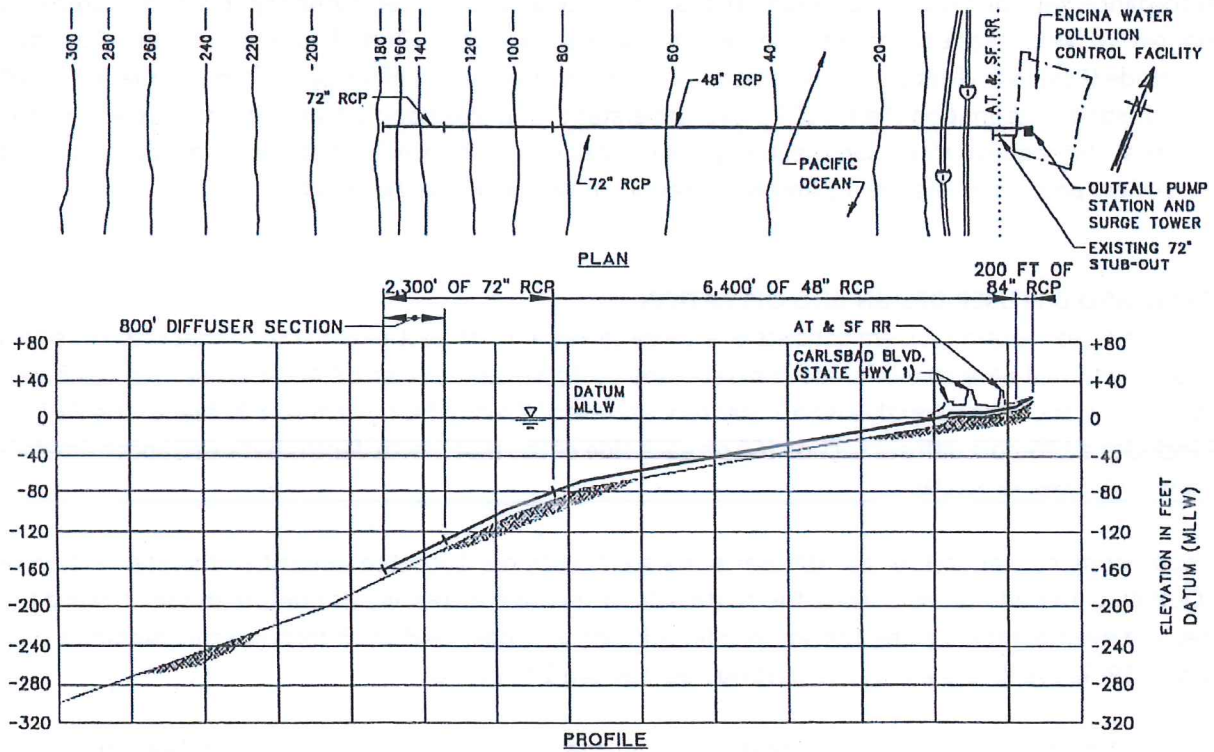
Existing Encina Ocean Outfall Plan and Profile (ref: MWH 1999)
